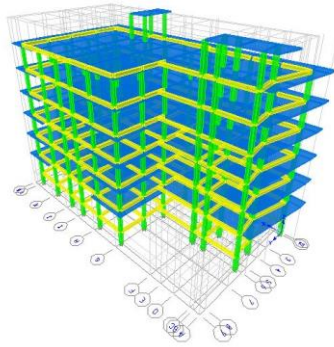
3D Finite Element Model of the 6 Storied Building
